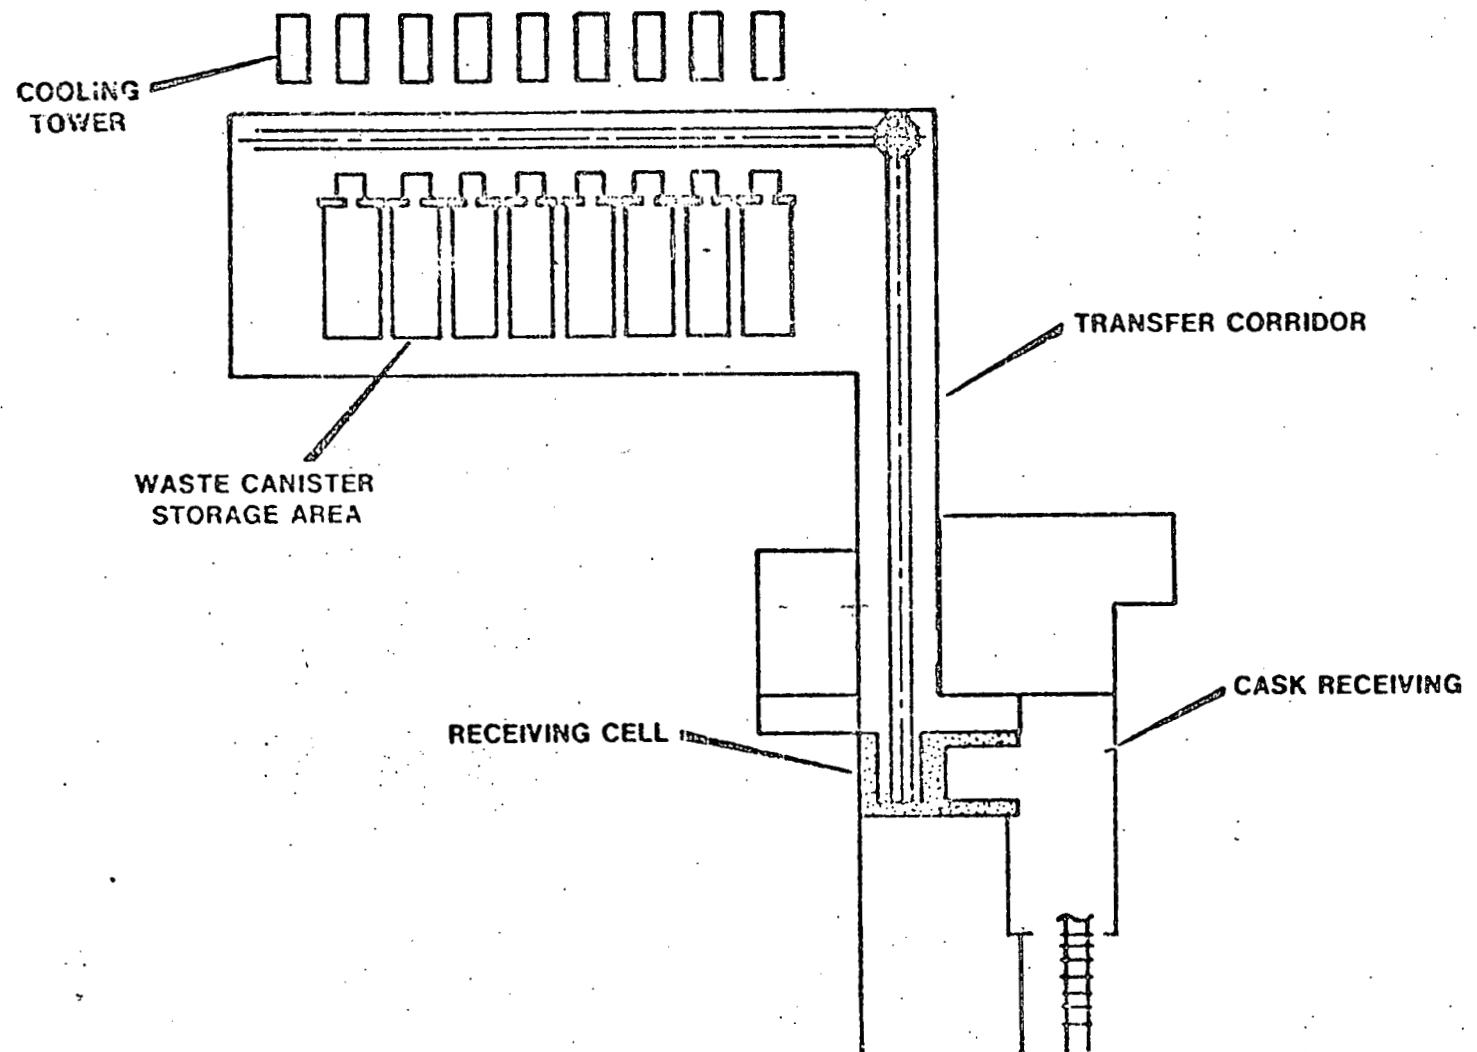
WATER BASIN CONCEPT - FACILITY LAYOUT
